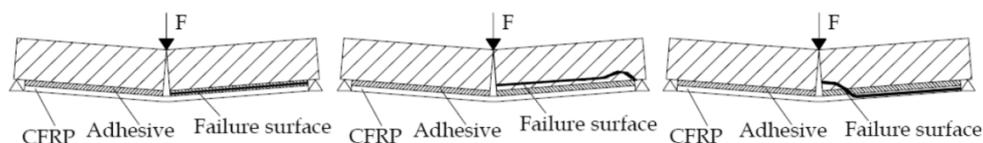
Failure modes observed for different temperature values (Di Tommaso et al. (2001)): (Left) Adhesive failure; (Middle) Concrete failure; (Right) Failure due to CFRP delamination.
